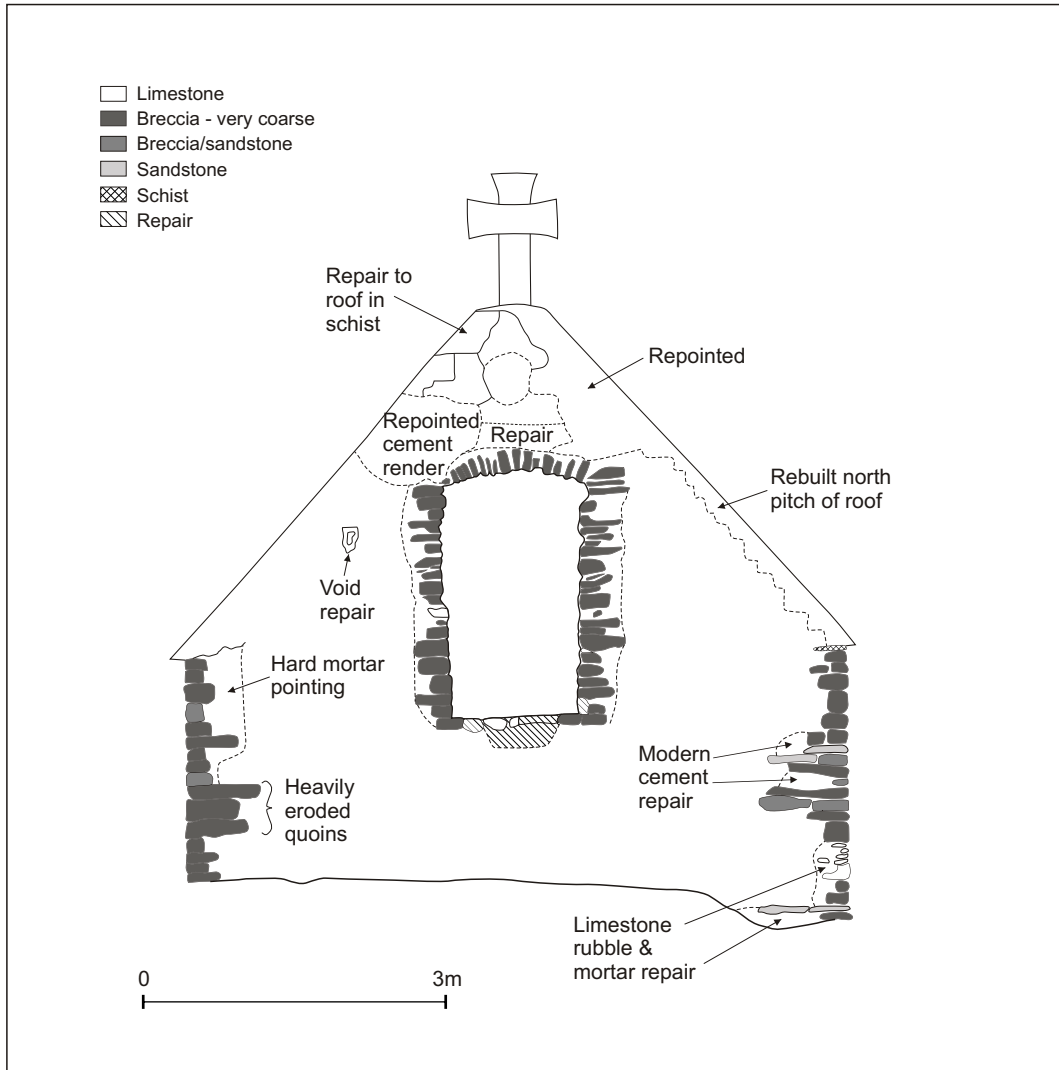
St Michael's Chapel, Torre east elevation measured drawing
